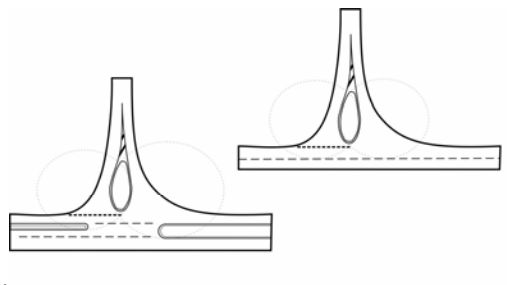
Example layout of a splitter island at a T-intersection
